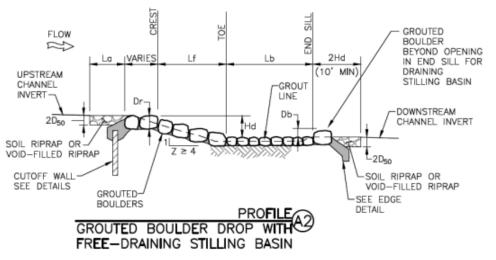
Grouted Boulder Drop Profile Drawing (MHFD, 2016)
